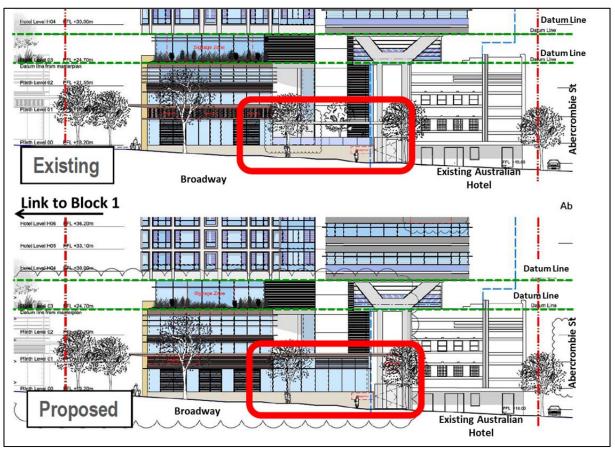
Approved and Proposed layout of outdoor terrace at the Broadway frontage.
